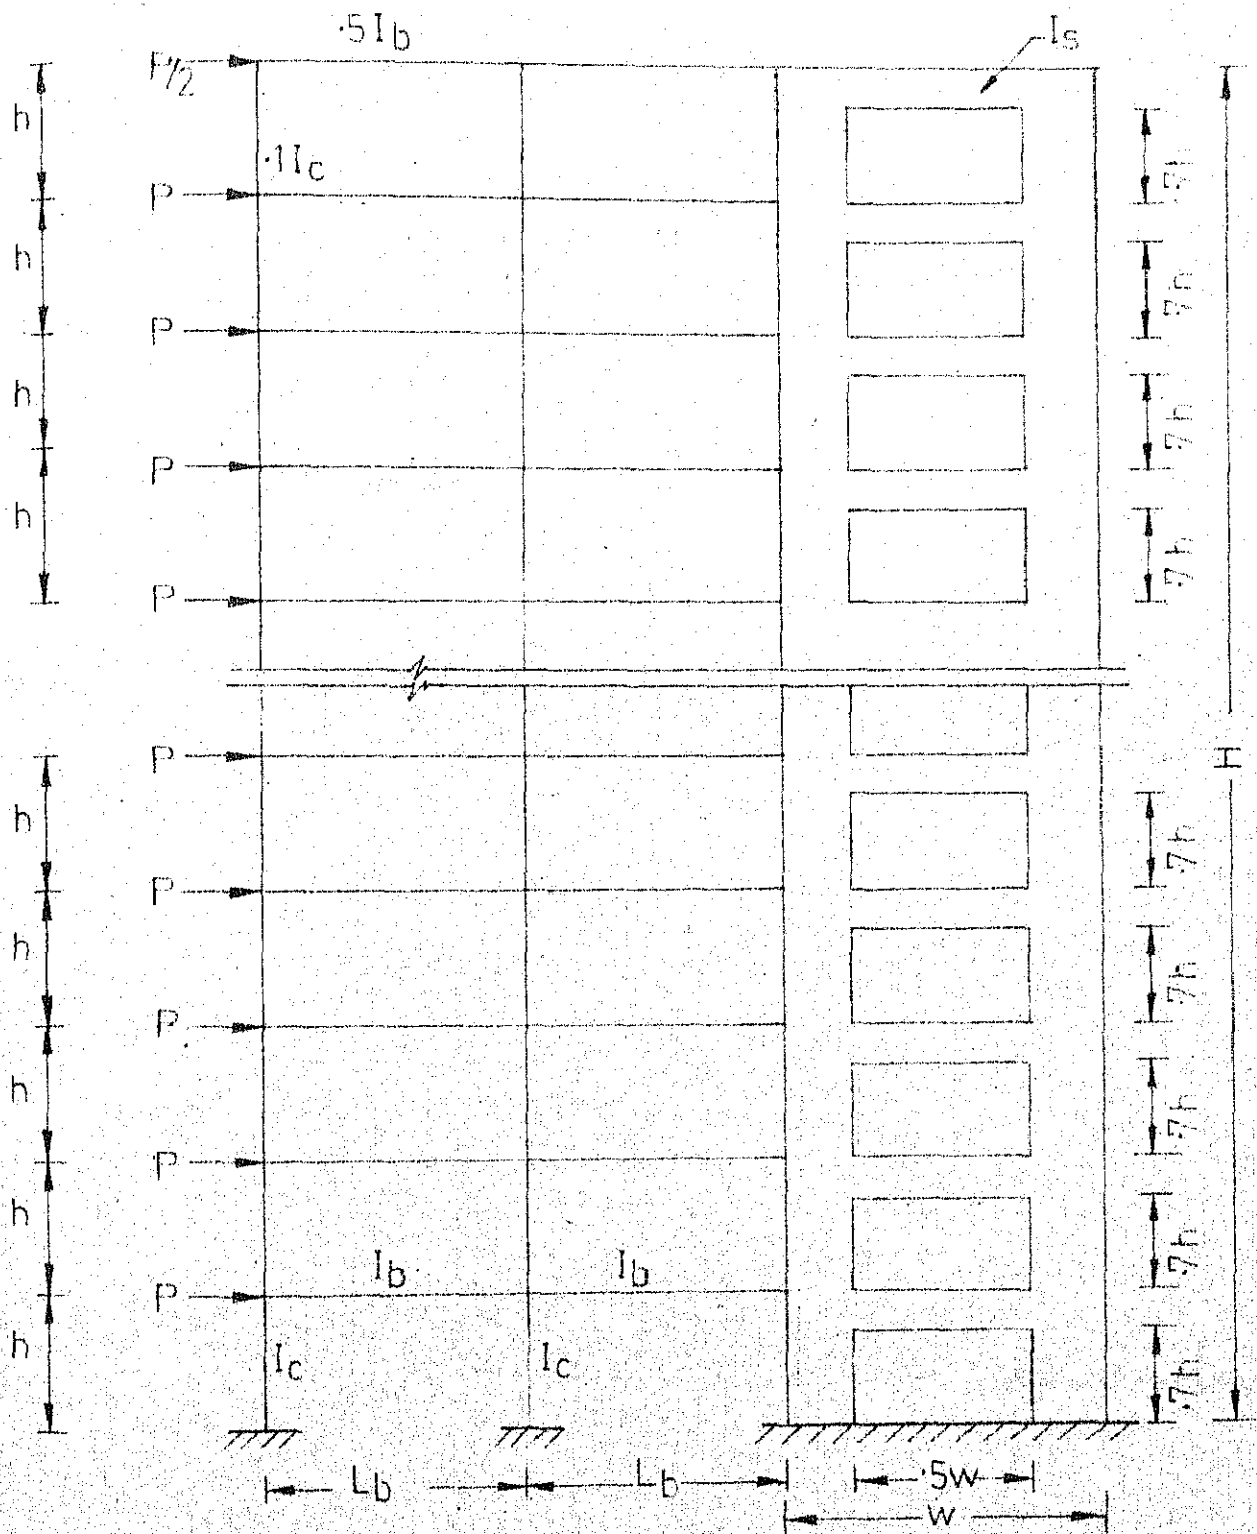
20 STOREY FRAME AND INTERCONNECTED SHEAR WALL WITH OPENINGS
